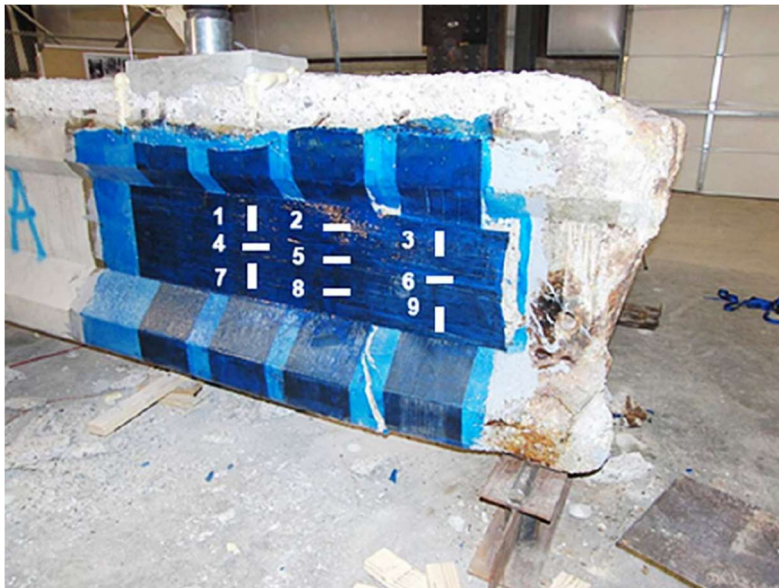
CFRP repair system with vertical U-Wrap and longitudinal strip anchorage (from Petty et al., 2011).
